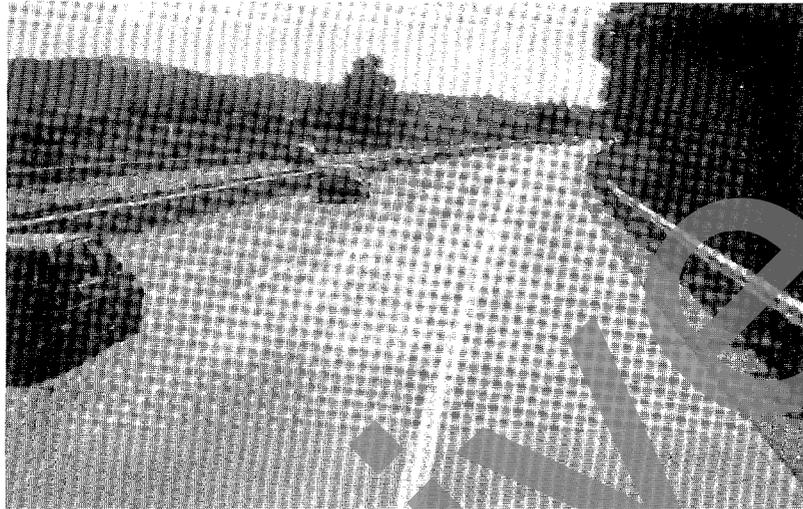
Photo of the A1 recycled concrete pavement near Salzburg, Austria.
